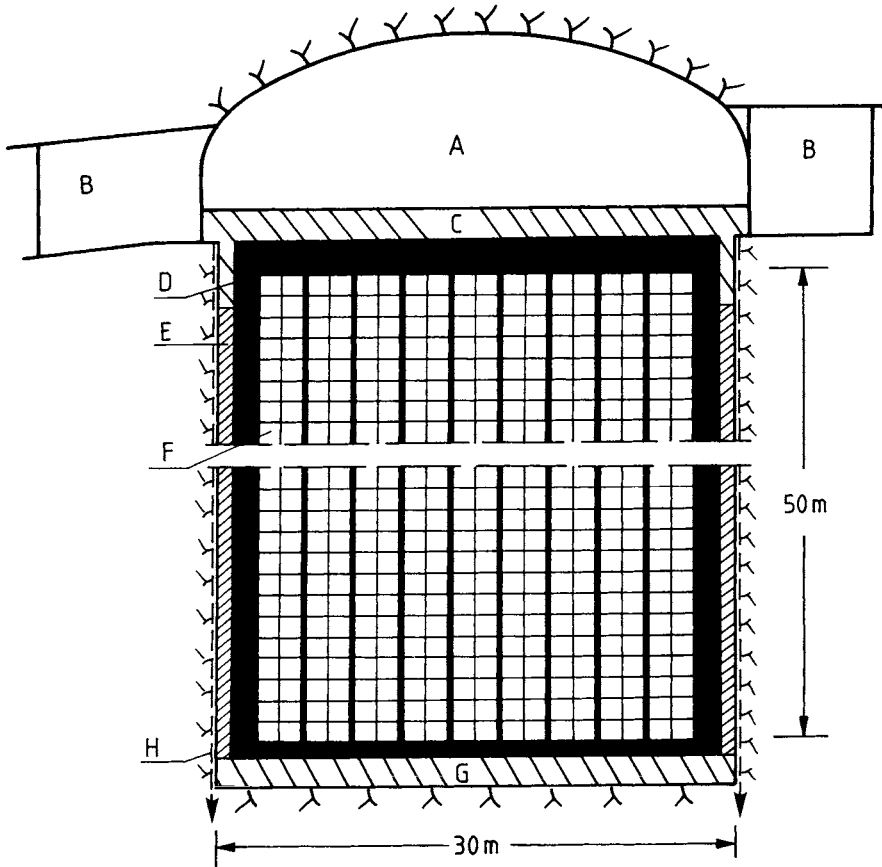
Schematic cross section of the silo cavern. A) Cement-stabilized sand-fill, B) Concrete plugs, C) Bentonite/sand top bed, D) Concrete silo, E) Bentonite backfill, F) Waste packs, G) Bentonite/sand bottom bed, H) Drains connected to tunnel system [4]
